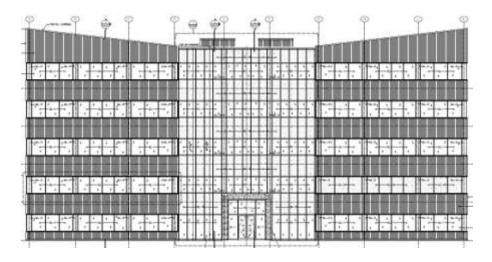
South Elevation (Image Credit: Silling Associates, Inc.)
